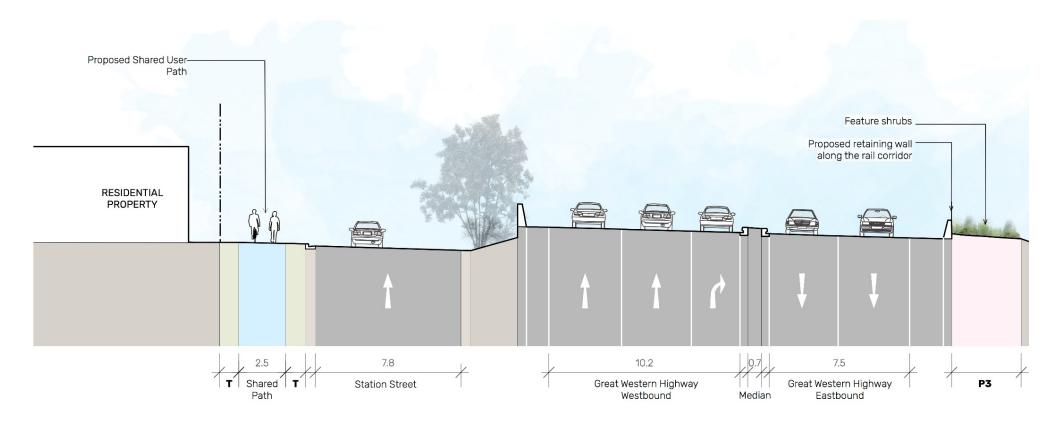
Typical cross section within northern portion of the proposal area near Station Street (SMM, 2021)
